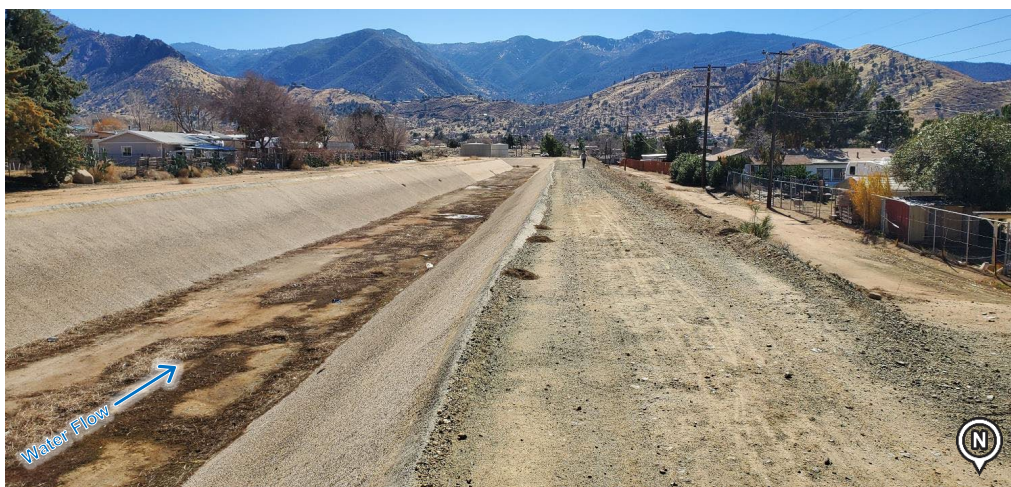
Concrete-lined Canal, Looking Downstream (Photo Date: 02/2021)
